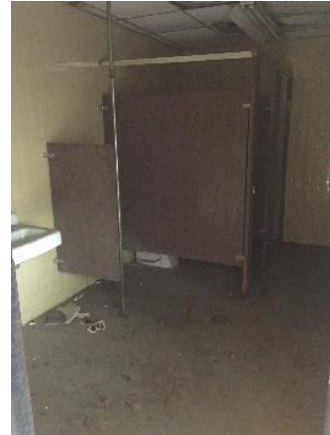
Example view of bathroom w/ asbestos-containing ceramic wall tile mortar, Loading Area #4 (Building 6).
